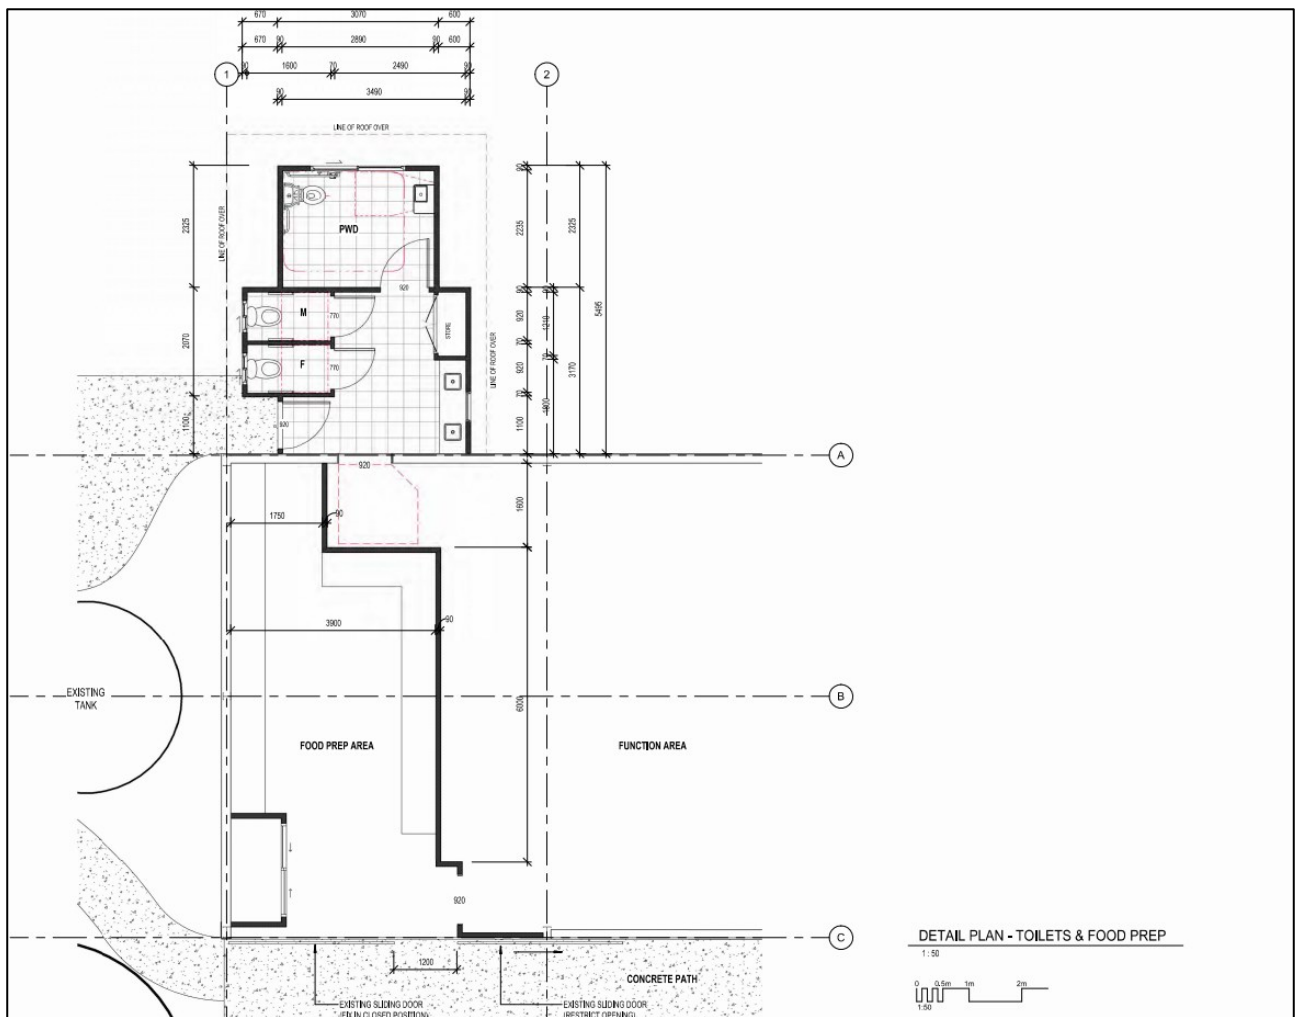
Approved Toilets and Food Prep Floor Plan for Function facility
